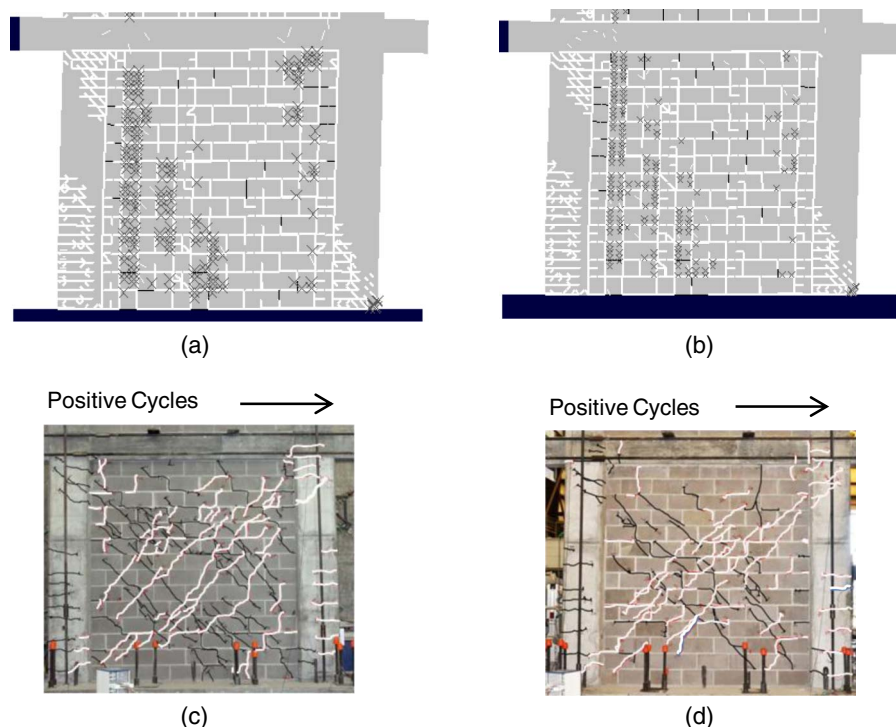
(a) Alternative meshing scheme; (b) masonry cracking observed in the test
